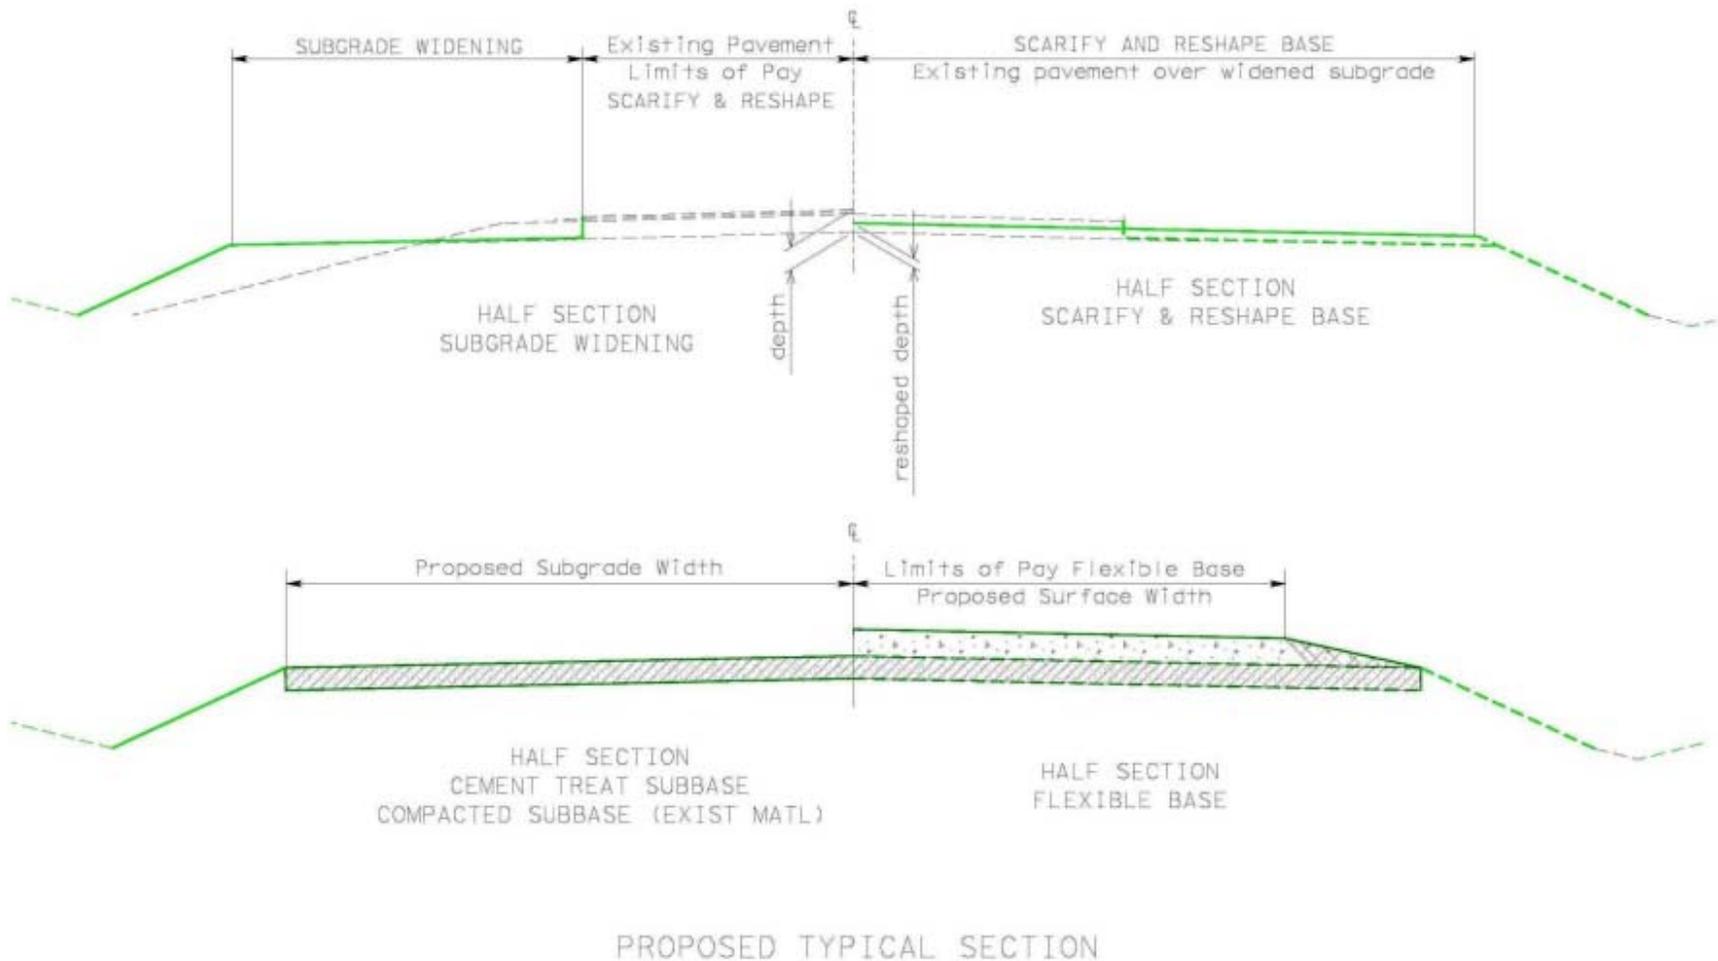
Typical Section for Low-Volume Roadway Repair in the Bryan District.
